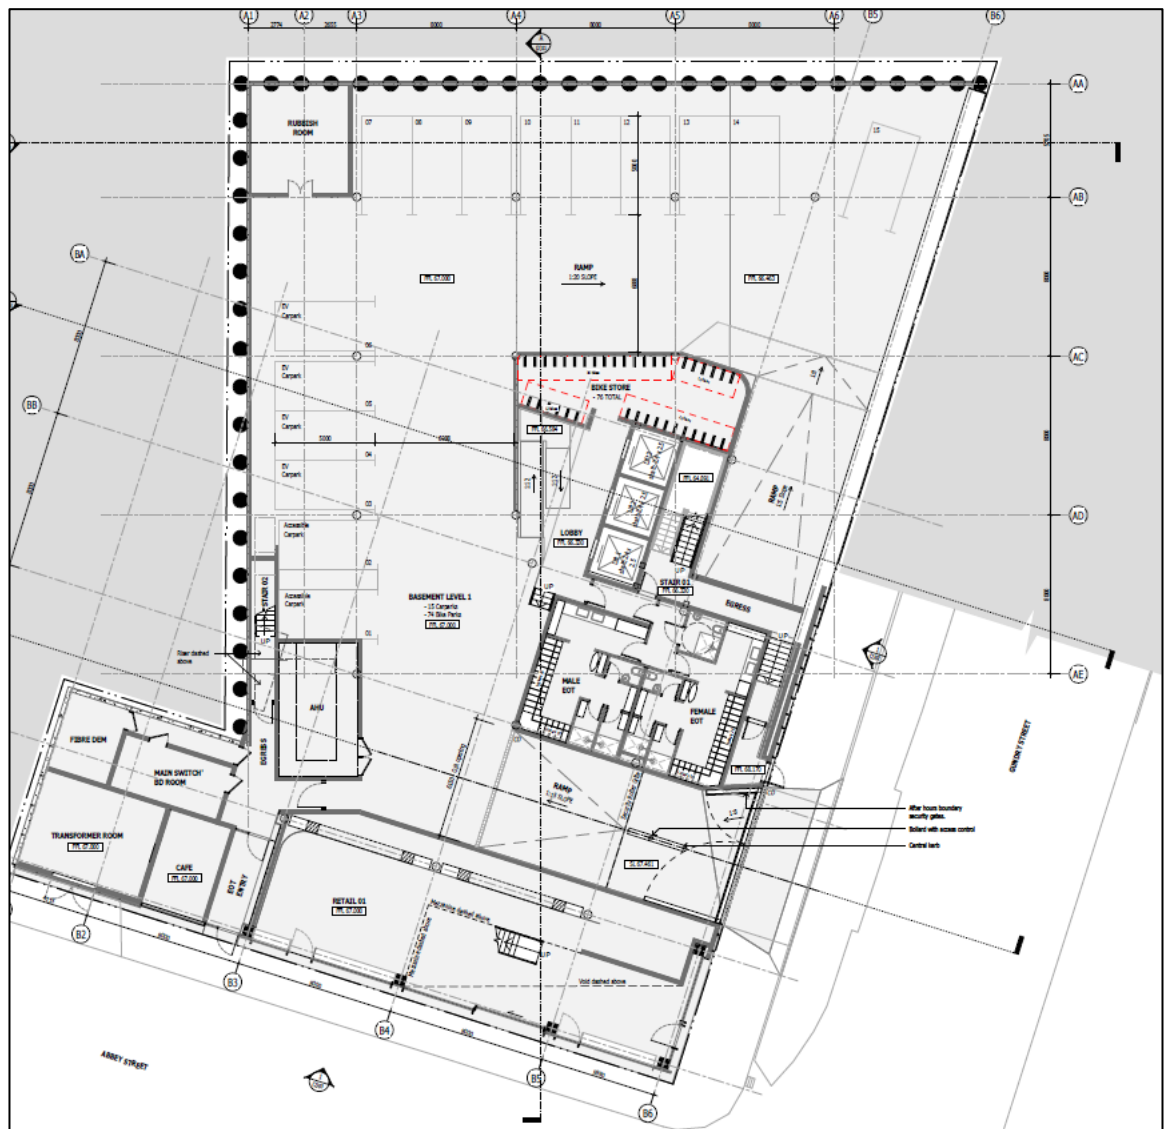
Level 1 Layout Plan of the proposed new commercial building (source: Fearon Hay)
